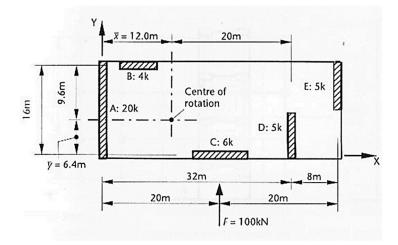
The systems with an unsymmetrical arrangement of walls (11, p. 51)
